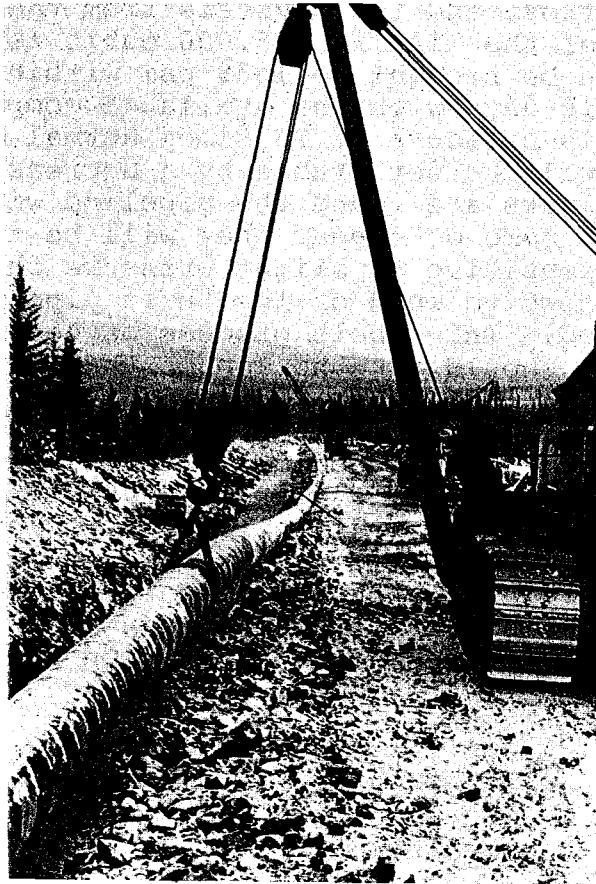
Pipe being lowered into trench. Note the water in the trench from the surrounding swamp.
